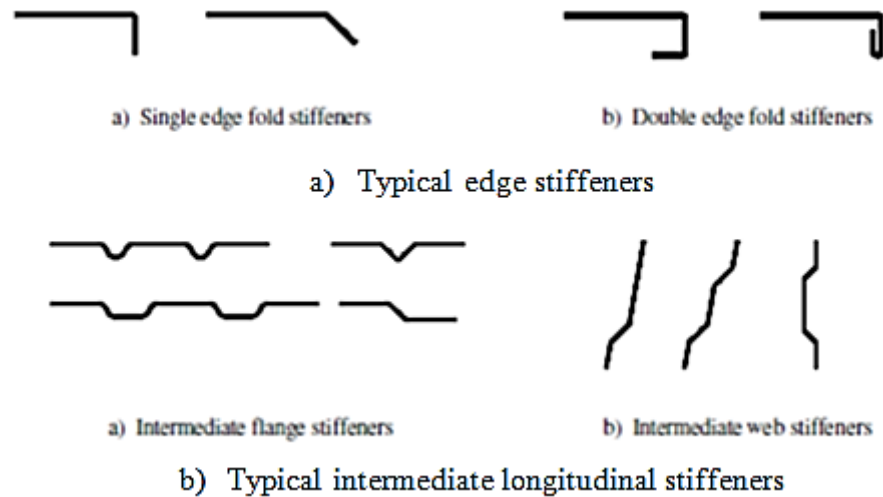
Typical a) edge stiffeners; b) intermediate longitudinal stiffeners (EN 1993-1-3:2006, 10)
